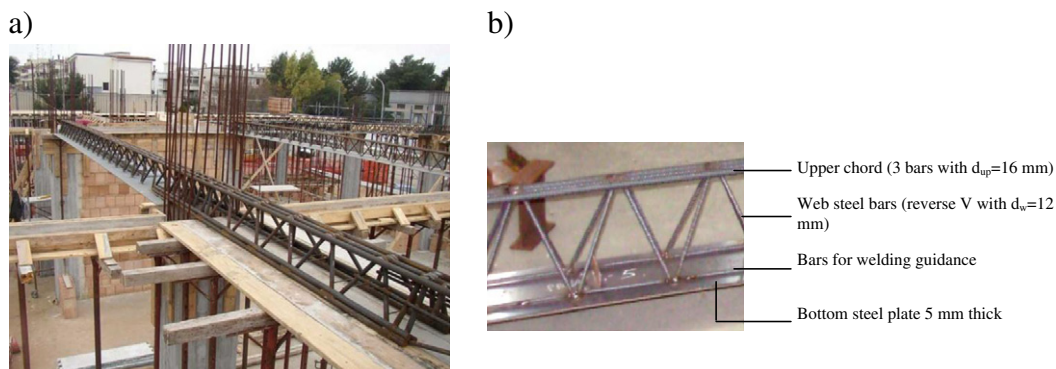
Typology of hybrid steel trussed–concrete beam: a) photo before concrete casting in r.c. framed structure; b) steel truss type utilized in experimental investigation.
